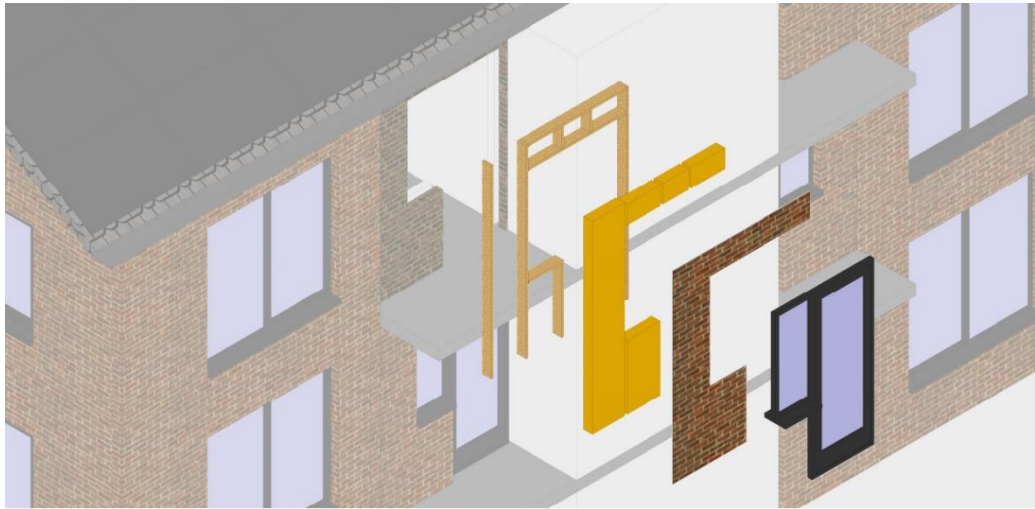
Facade element balcony construction, Source: own illustration.
